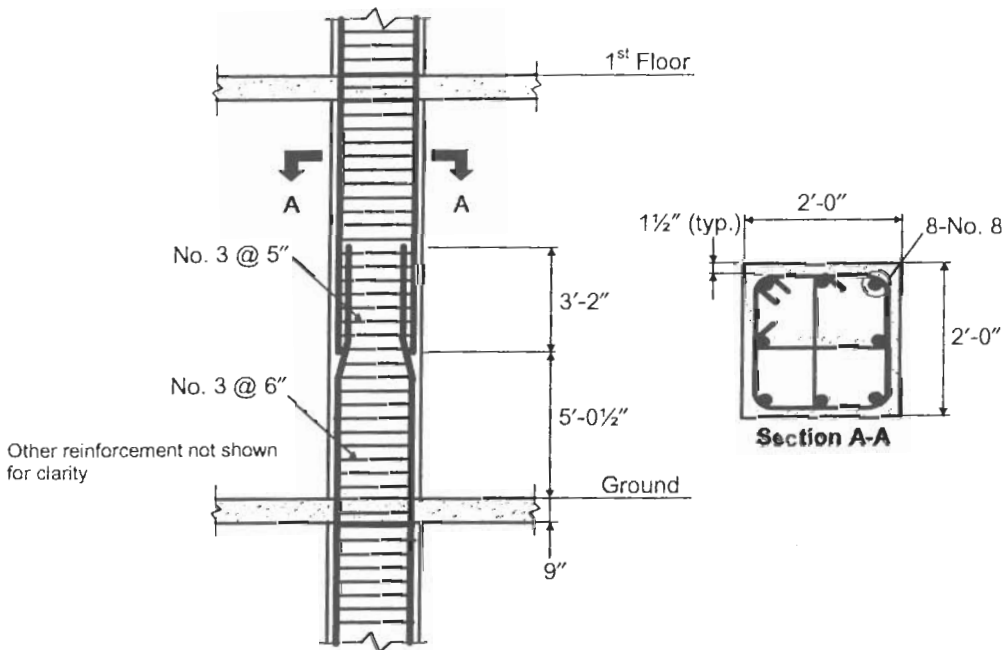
Reinforcement Details for Column B2 Supporting the 1<sup>st</sup> Floor Level (SDC C)
